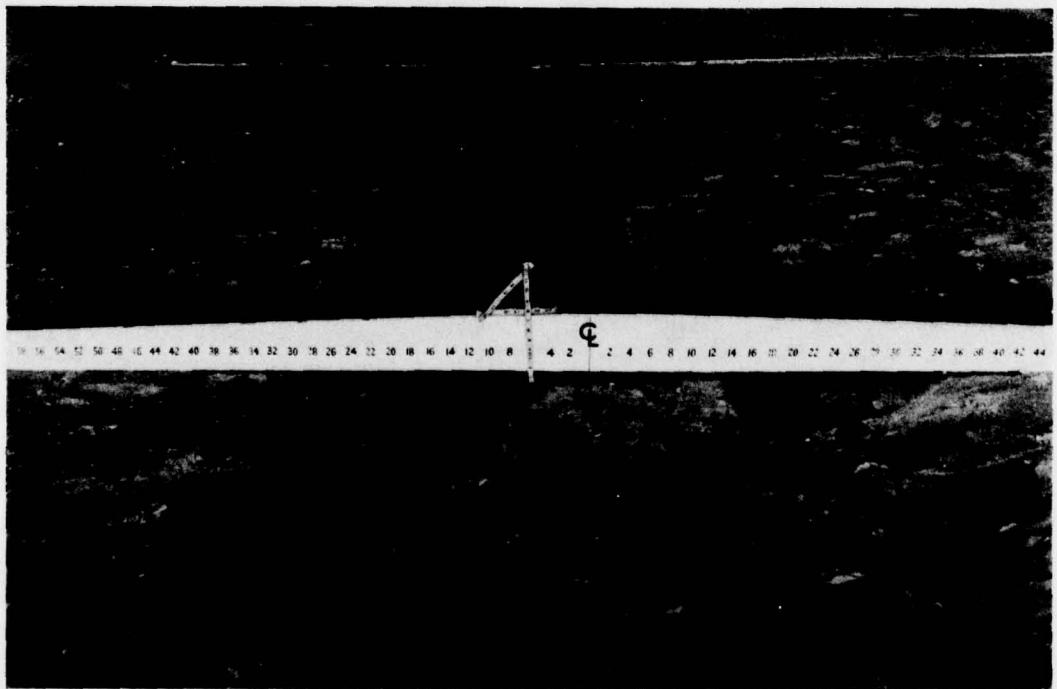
General view of Test Section No. 2, item 1, at end of traffic
